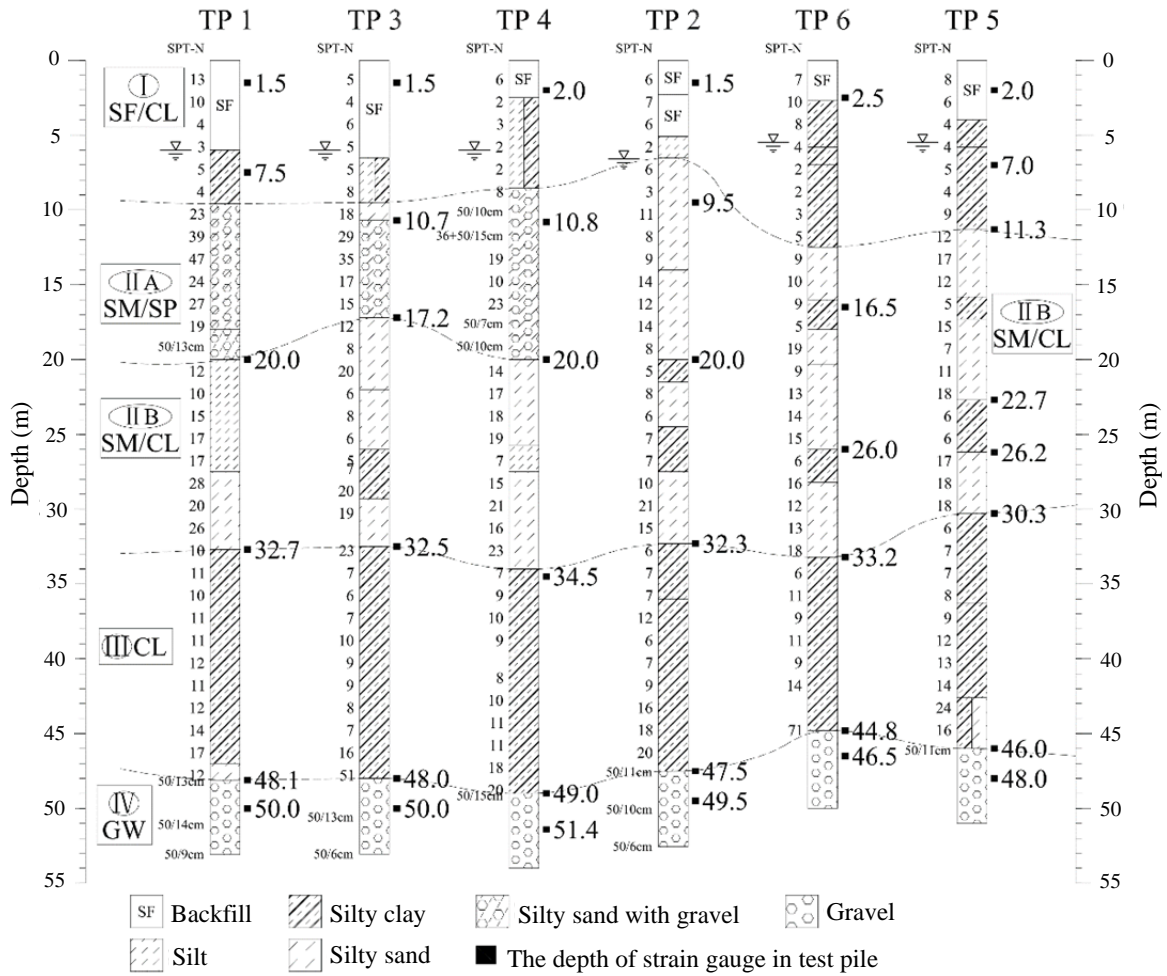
Boring logs at the location of test barrette pile and depths of strain gauge installed (Taipei site)
